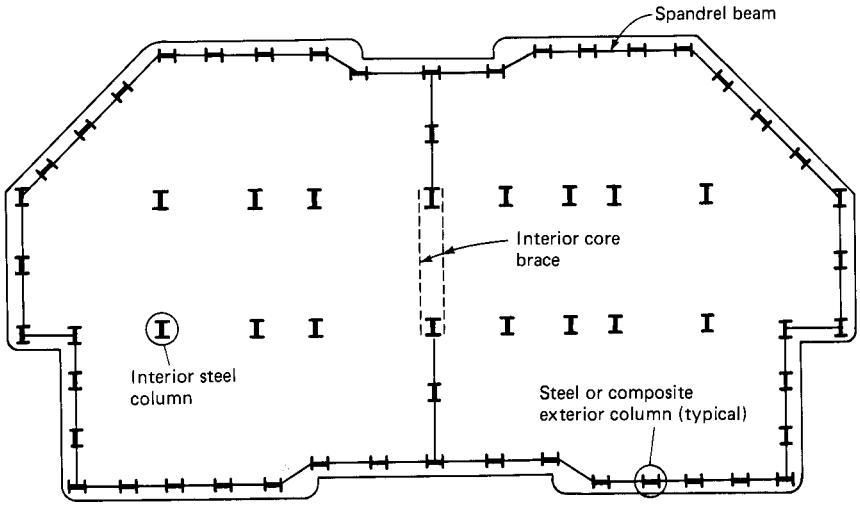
Twin tube system with 15-ft (4.57-m) column spacing.
